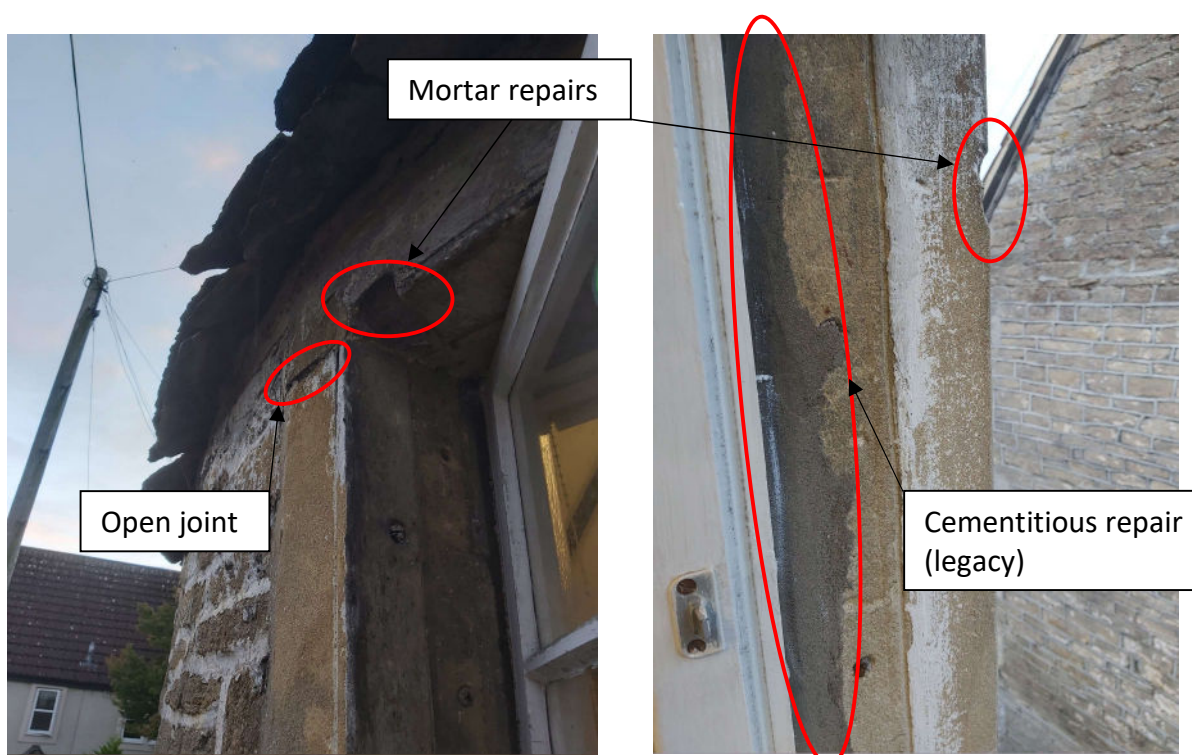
first floor window jambs & lintels requiring repointing, crack-stitching & lime mortar repairs.
